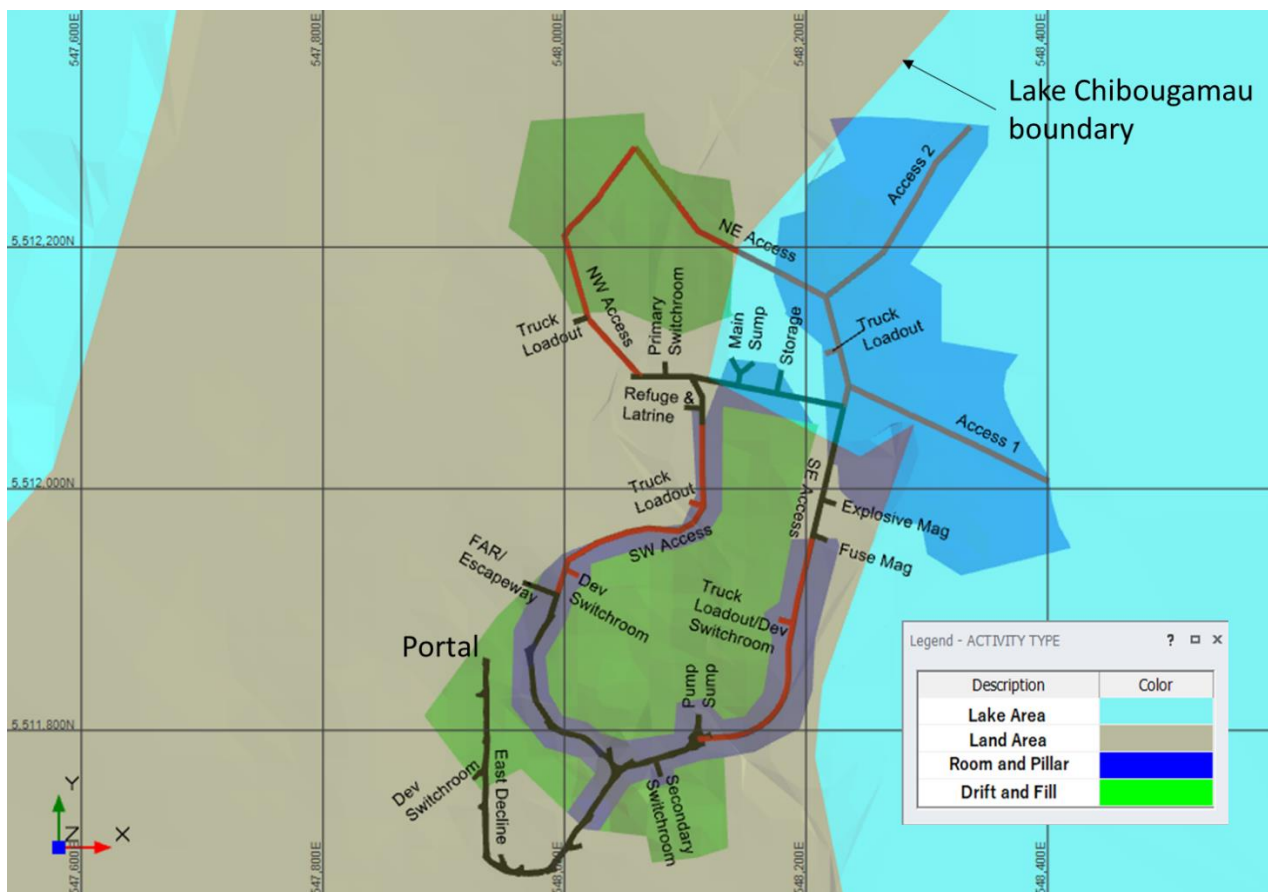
Mining method - Proposed Devlin mine (plan view)
